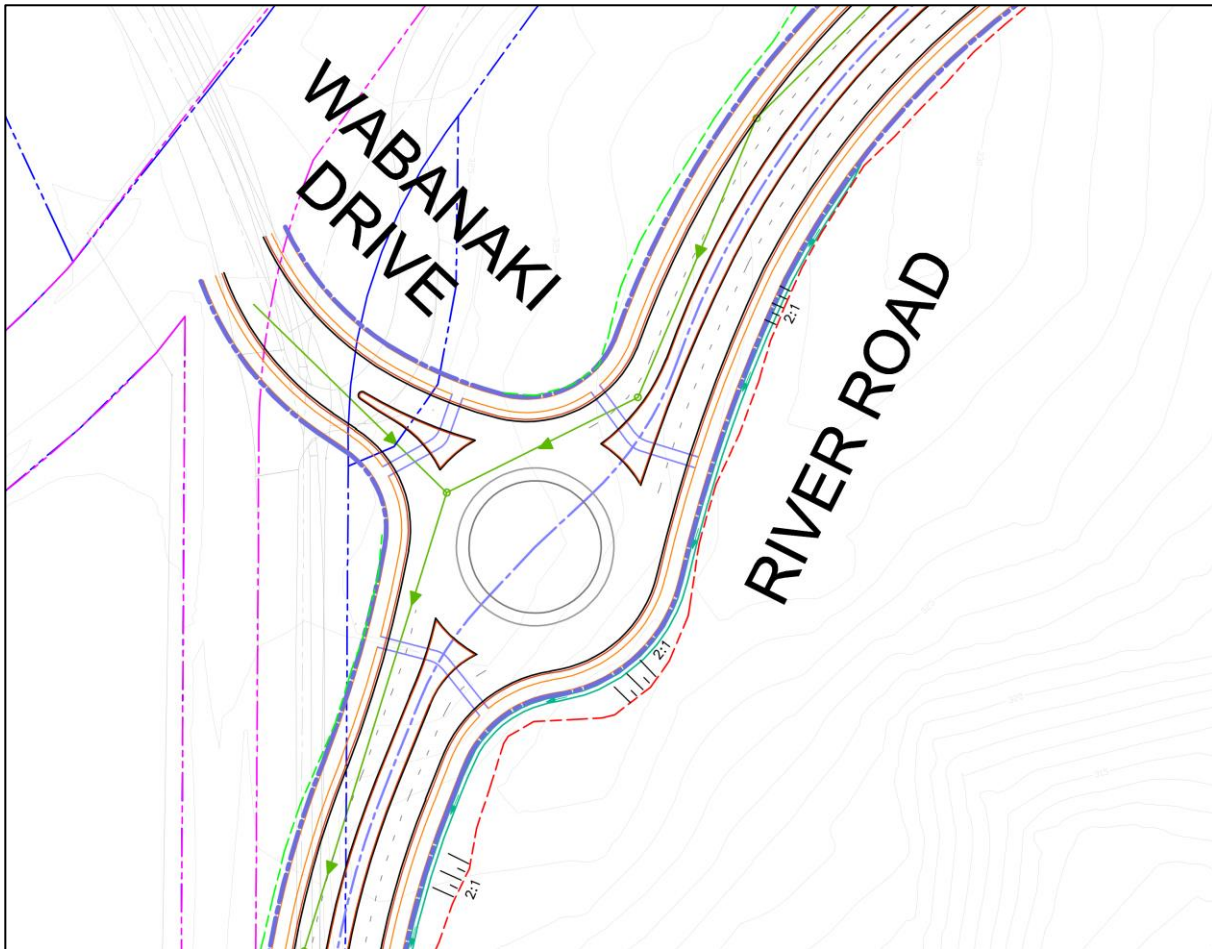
1: Future River Road Extension and Wabanaki Drive Roundabout Design Concept
